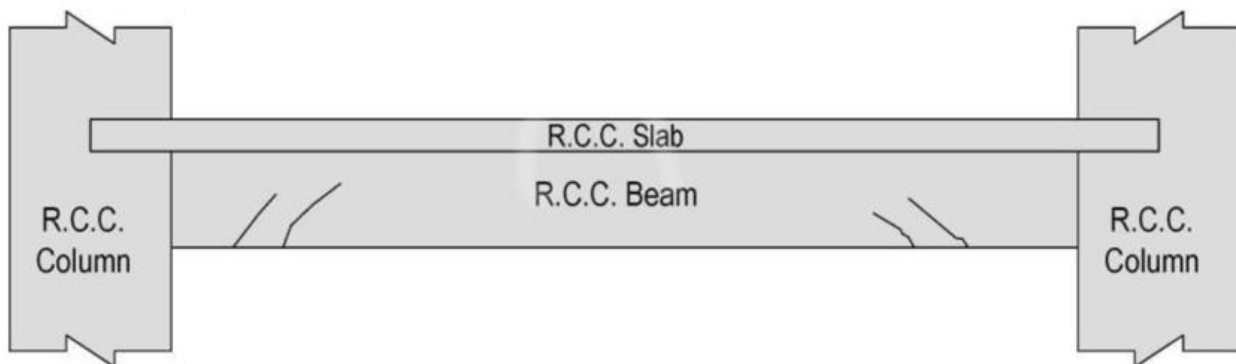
Shear cracks in RC beams (Jaydutt Tailor, 2017).
